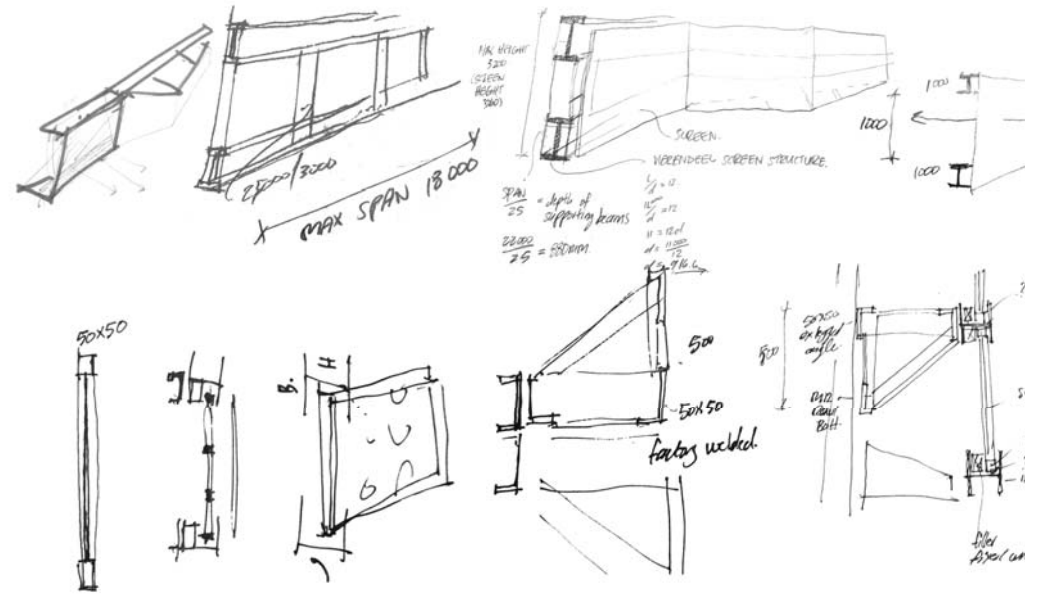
Detail: cantilever beam to slab mounted channel
